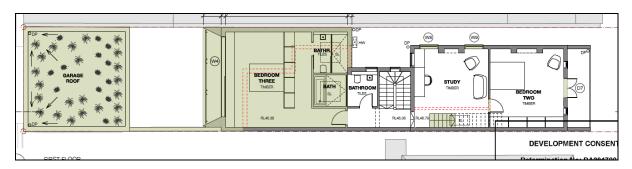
Approved First Floor Plan – No.94 Douglas Street, Stanmore
